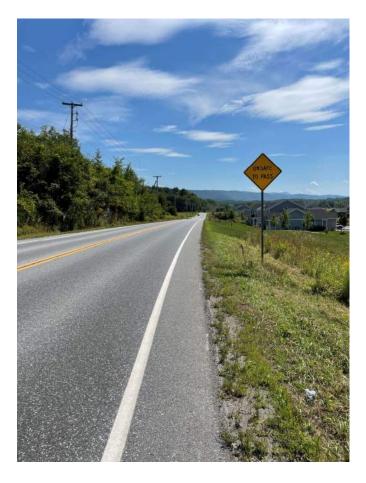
Southbound view on VT Route 116, taken North of Buck Hill Road on the West side of the road.
